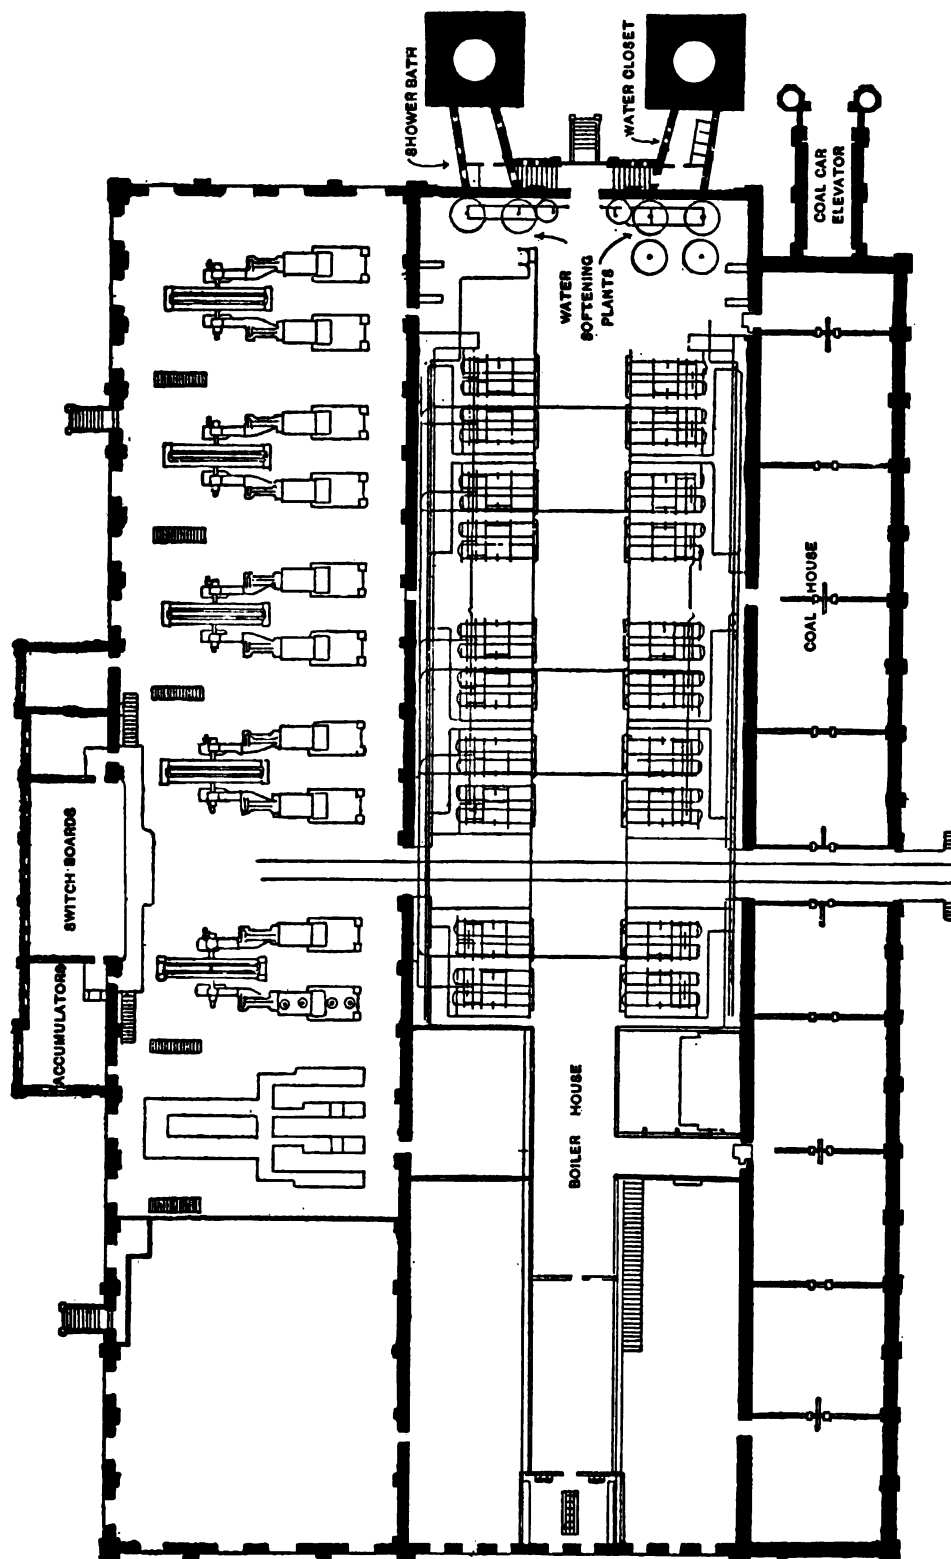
Railway Plant of the Vienna Municipal Installation (*Engineering Magazine*).
